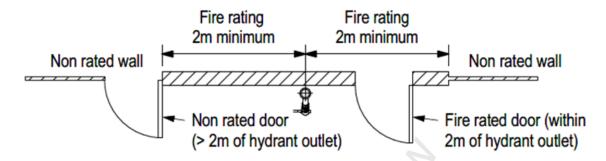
(a) – Non sprinklered building – Hydrant outlet protection Fire rating options with doors – Plan view
